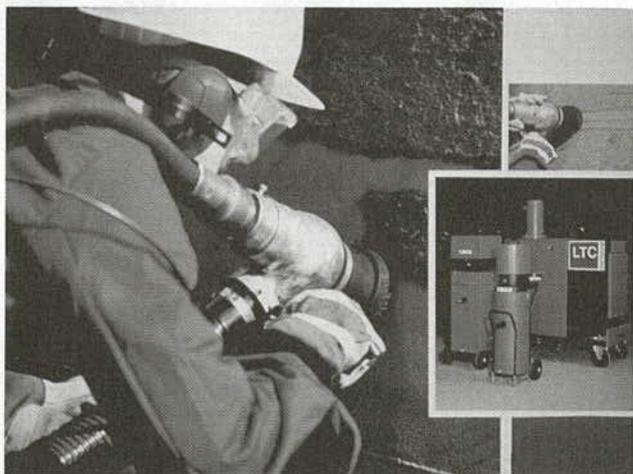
Operation of vacuum head for vacuum blasting (courtesy LTC Incorporated).
